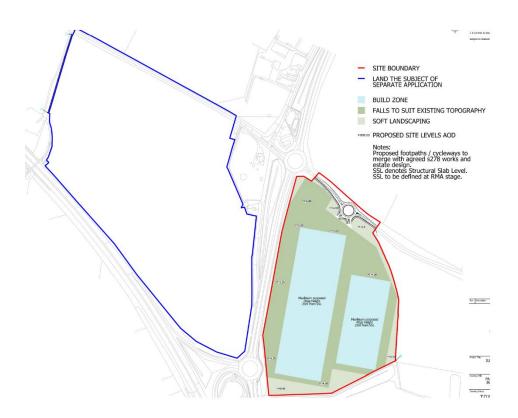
Extract of Eastern Site Building Heights Parameter Plan
